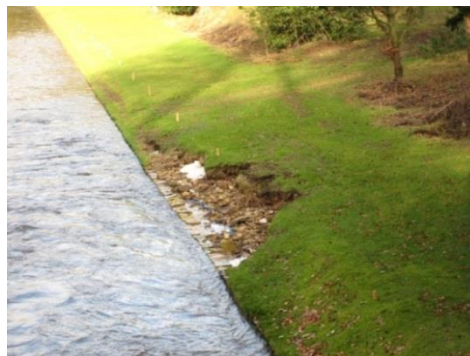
Water damage to bank just below Rustic Bridge in 2011
